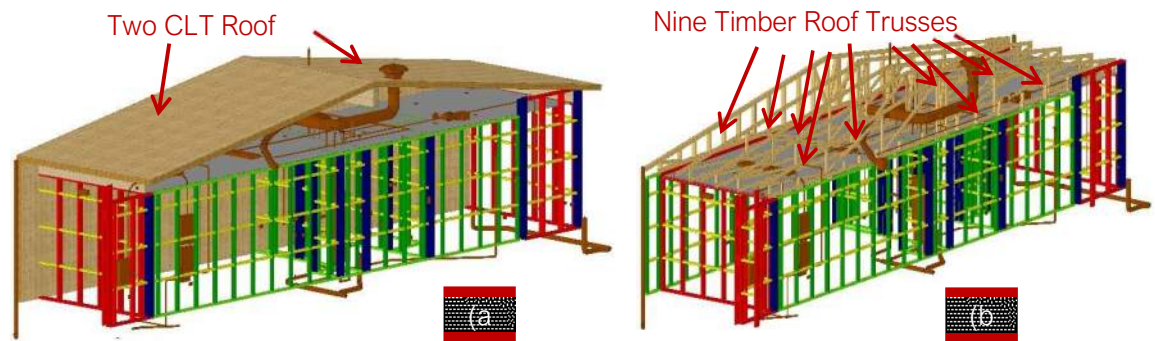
Number of elements in CLT composite system versus Timber Frame and Truss system; a) CLT roof; b) Timber roof truss.
